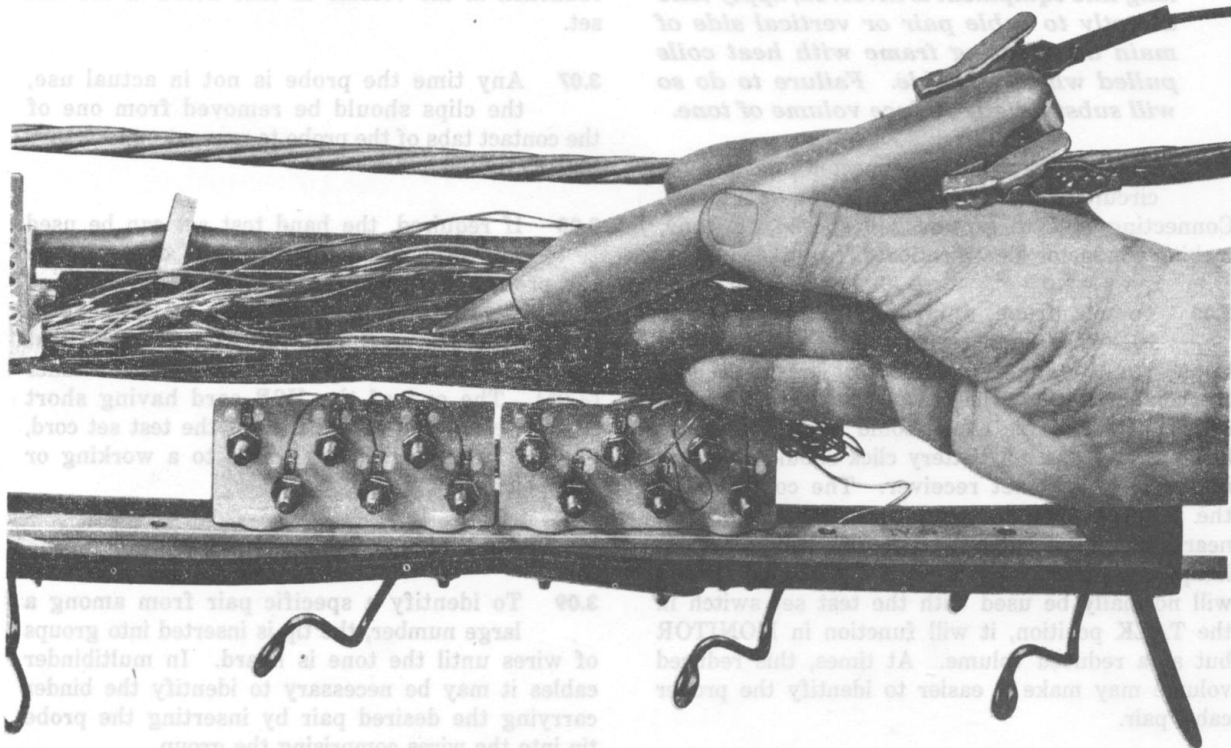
Pair Identification at Ready Access Terminal Using Test Probe
